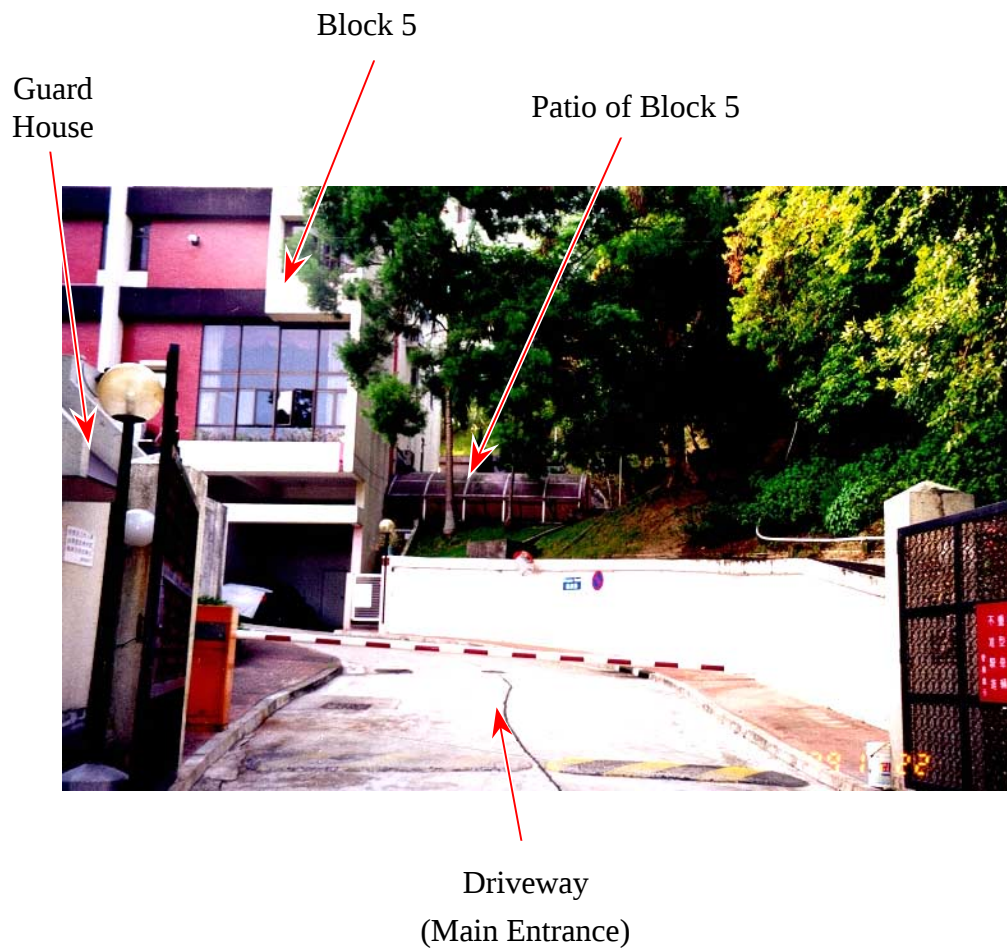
Residential Building Block 5, Guard House and Driveway near Main Entrance of Woodcrest Hill (Photograph Taken on 22 November 1999)
